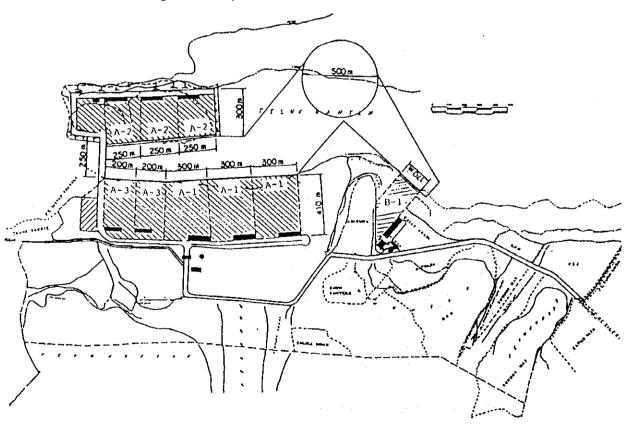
Layout of Bojonegara (Alternative IV)
